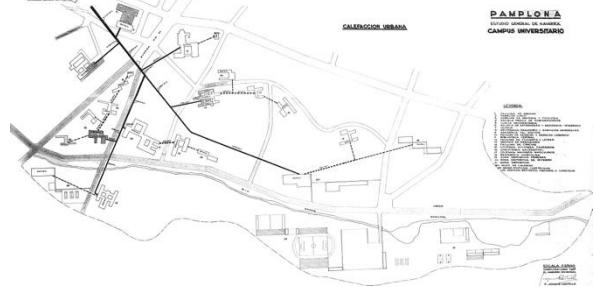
Drawing of the layout of Pamplona District Heating preliminary design drawn by Joaquín Castiella in 1961 [16] [17] [18].
